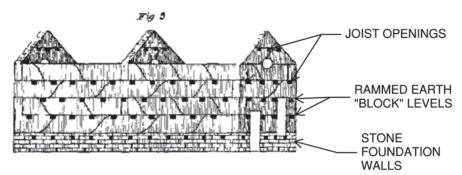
Typical rammed earth farmhouse construction (Johnson, 1806).
